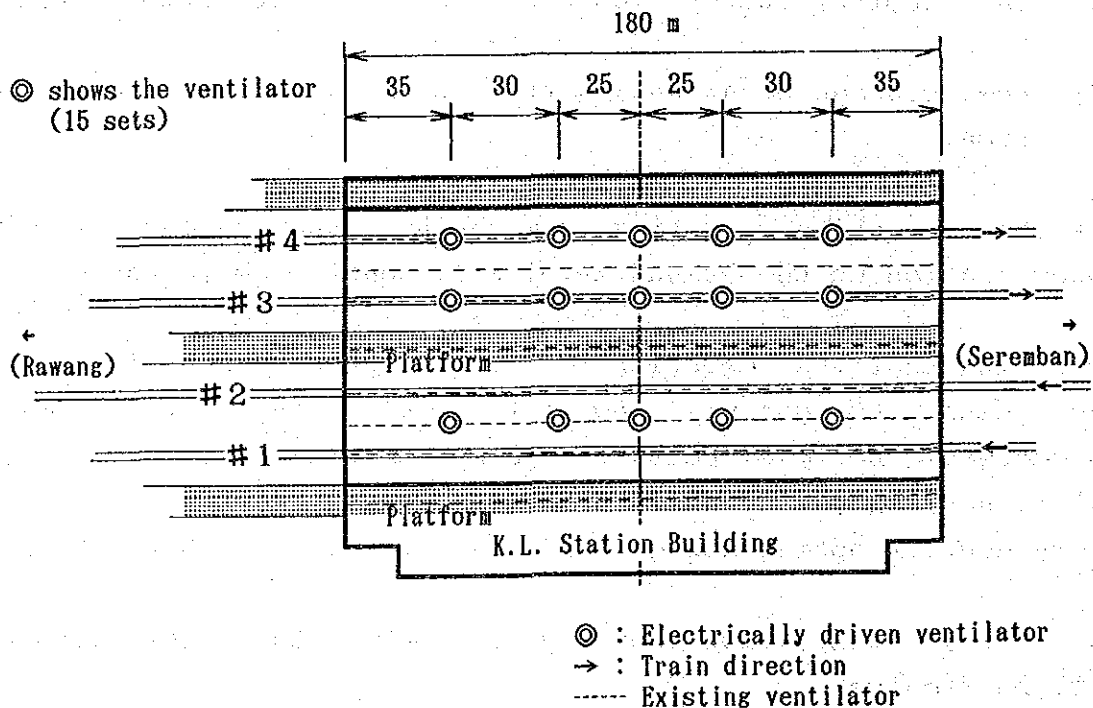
Installation Plan of Ventilators at K.L. Station
